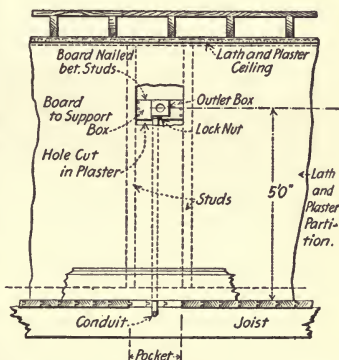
Conduit run to a bracket outlet in a finished building.
